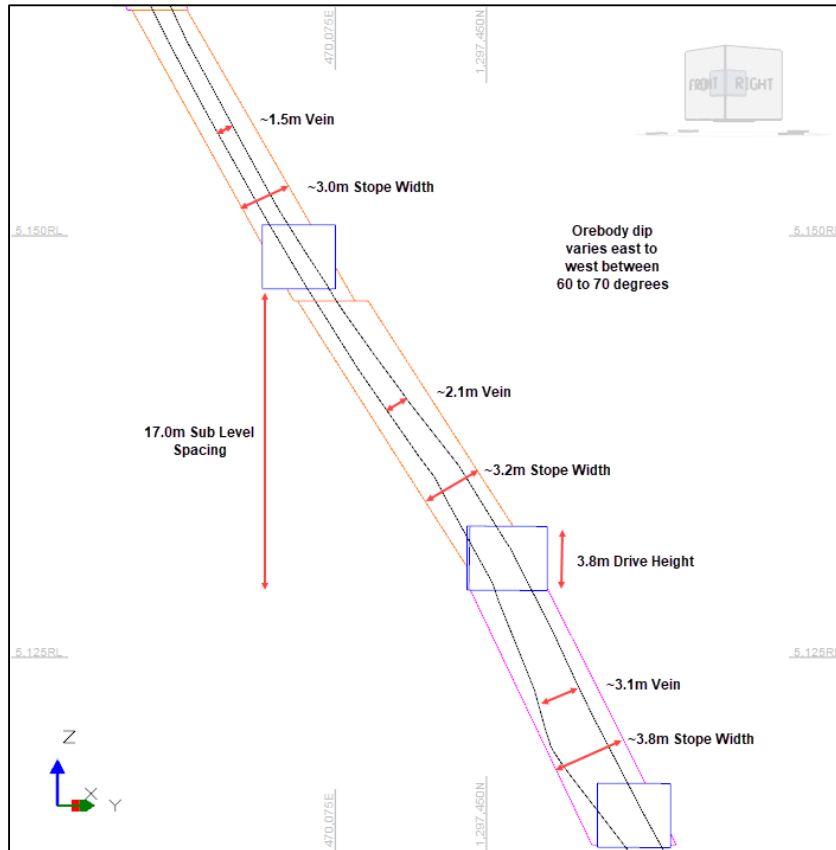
Typical Cross Section Bagassi South QV1 – Stopping Layout and Mineralization
